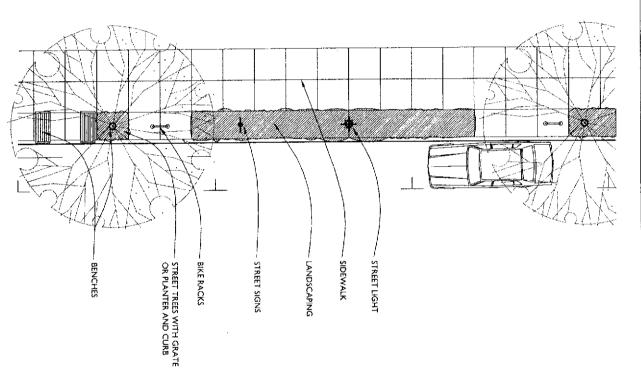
PLANTING POCKETS ALONG ROADWAYS
